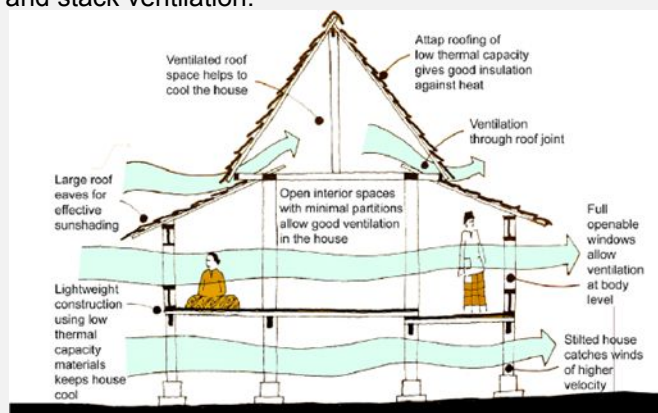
A cross section of a typical Malay Vernacular House (Source: Lim, 1987)
